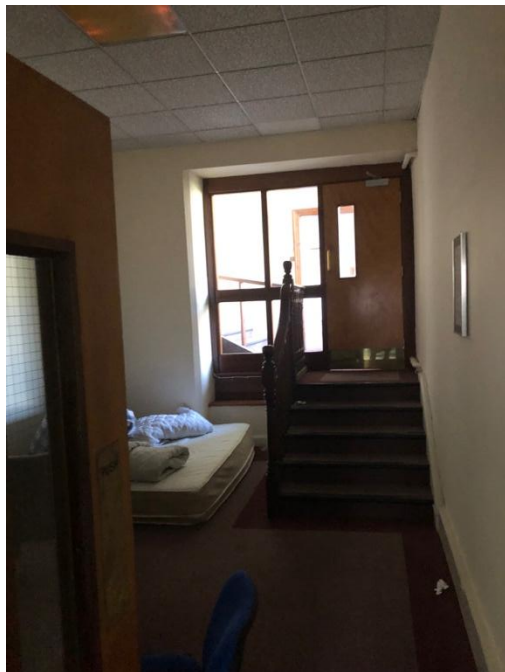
Stair access from 1st floor level of Milltown Park House to rear extension block, from within a modified rear room to southwest
